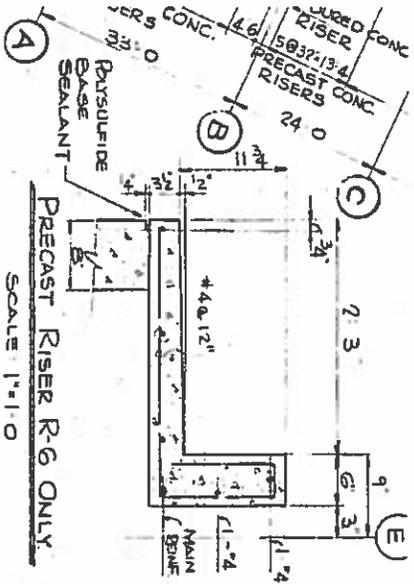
Precast Riser Joint Sealant Details - Horizontal Joint
